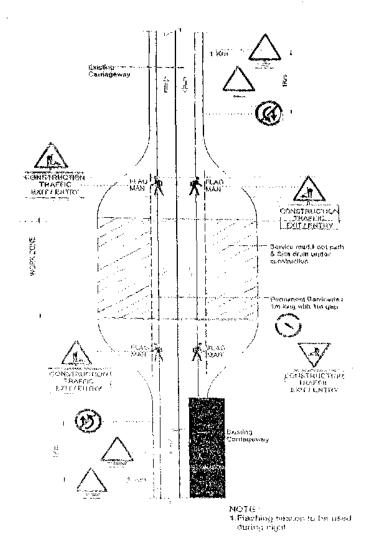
Layout of Traffic Control Devices For Urban Section (Stage-I) Construction of Service Road, Foot Path and Side Drain.
